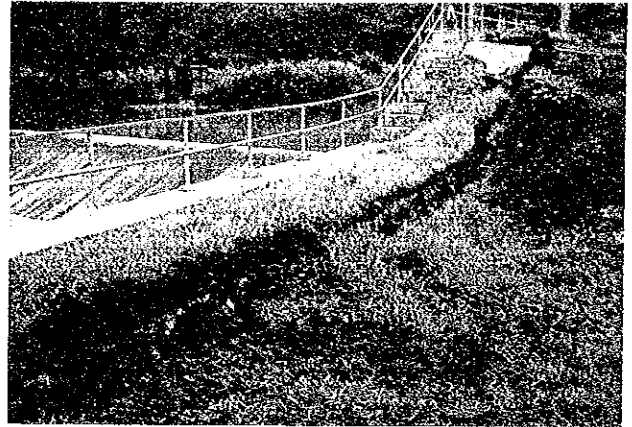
Tilting of Parapet Wall and Settlement of Back-fill
